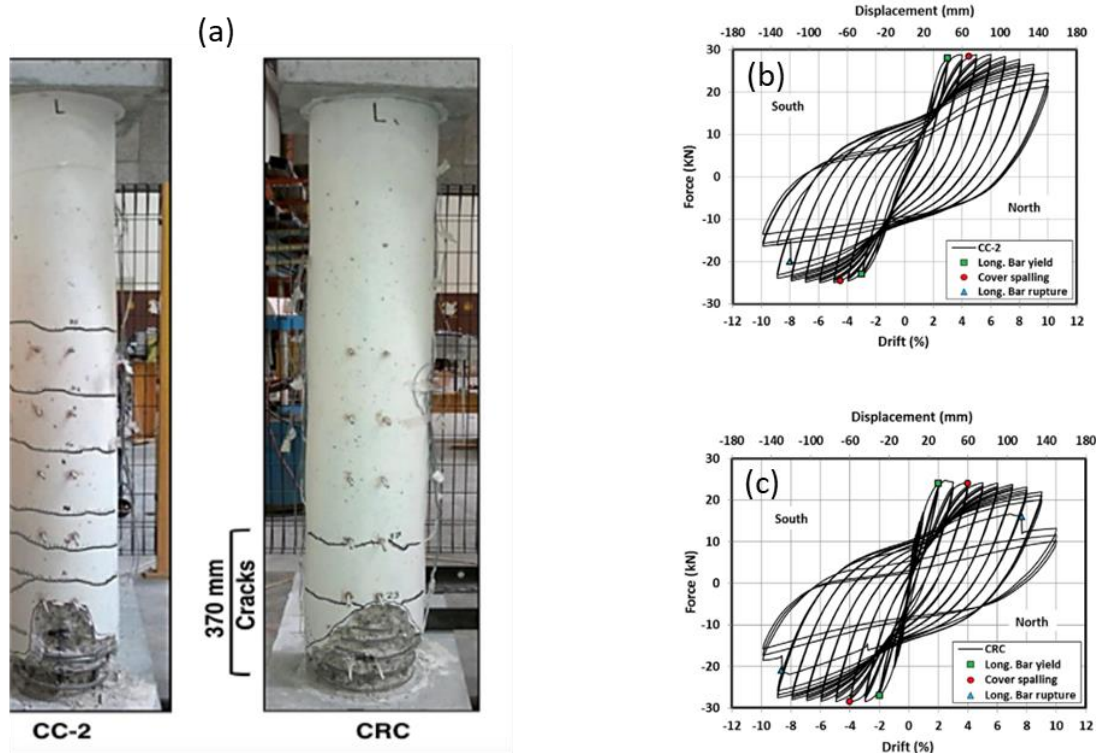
(a) Post-failure propagation of cracks; (b) hysteretic behaviour of conventional reinforced concrete; and (c) rubberised concrete (from Youssf et al 2015).
